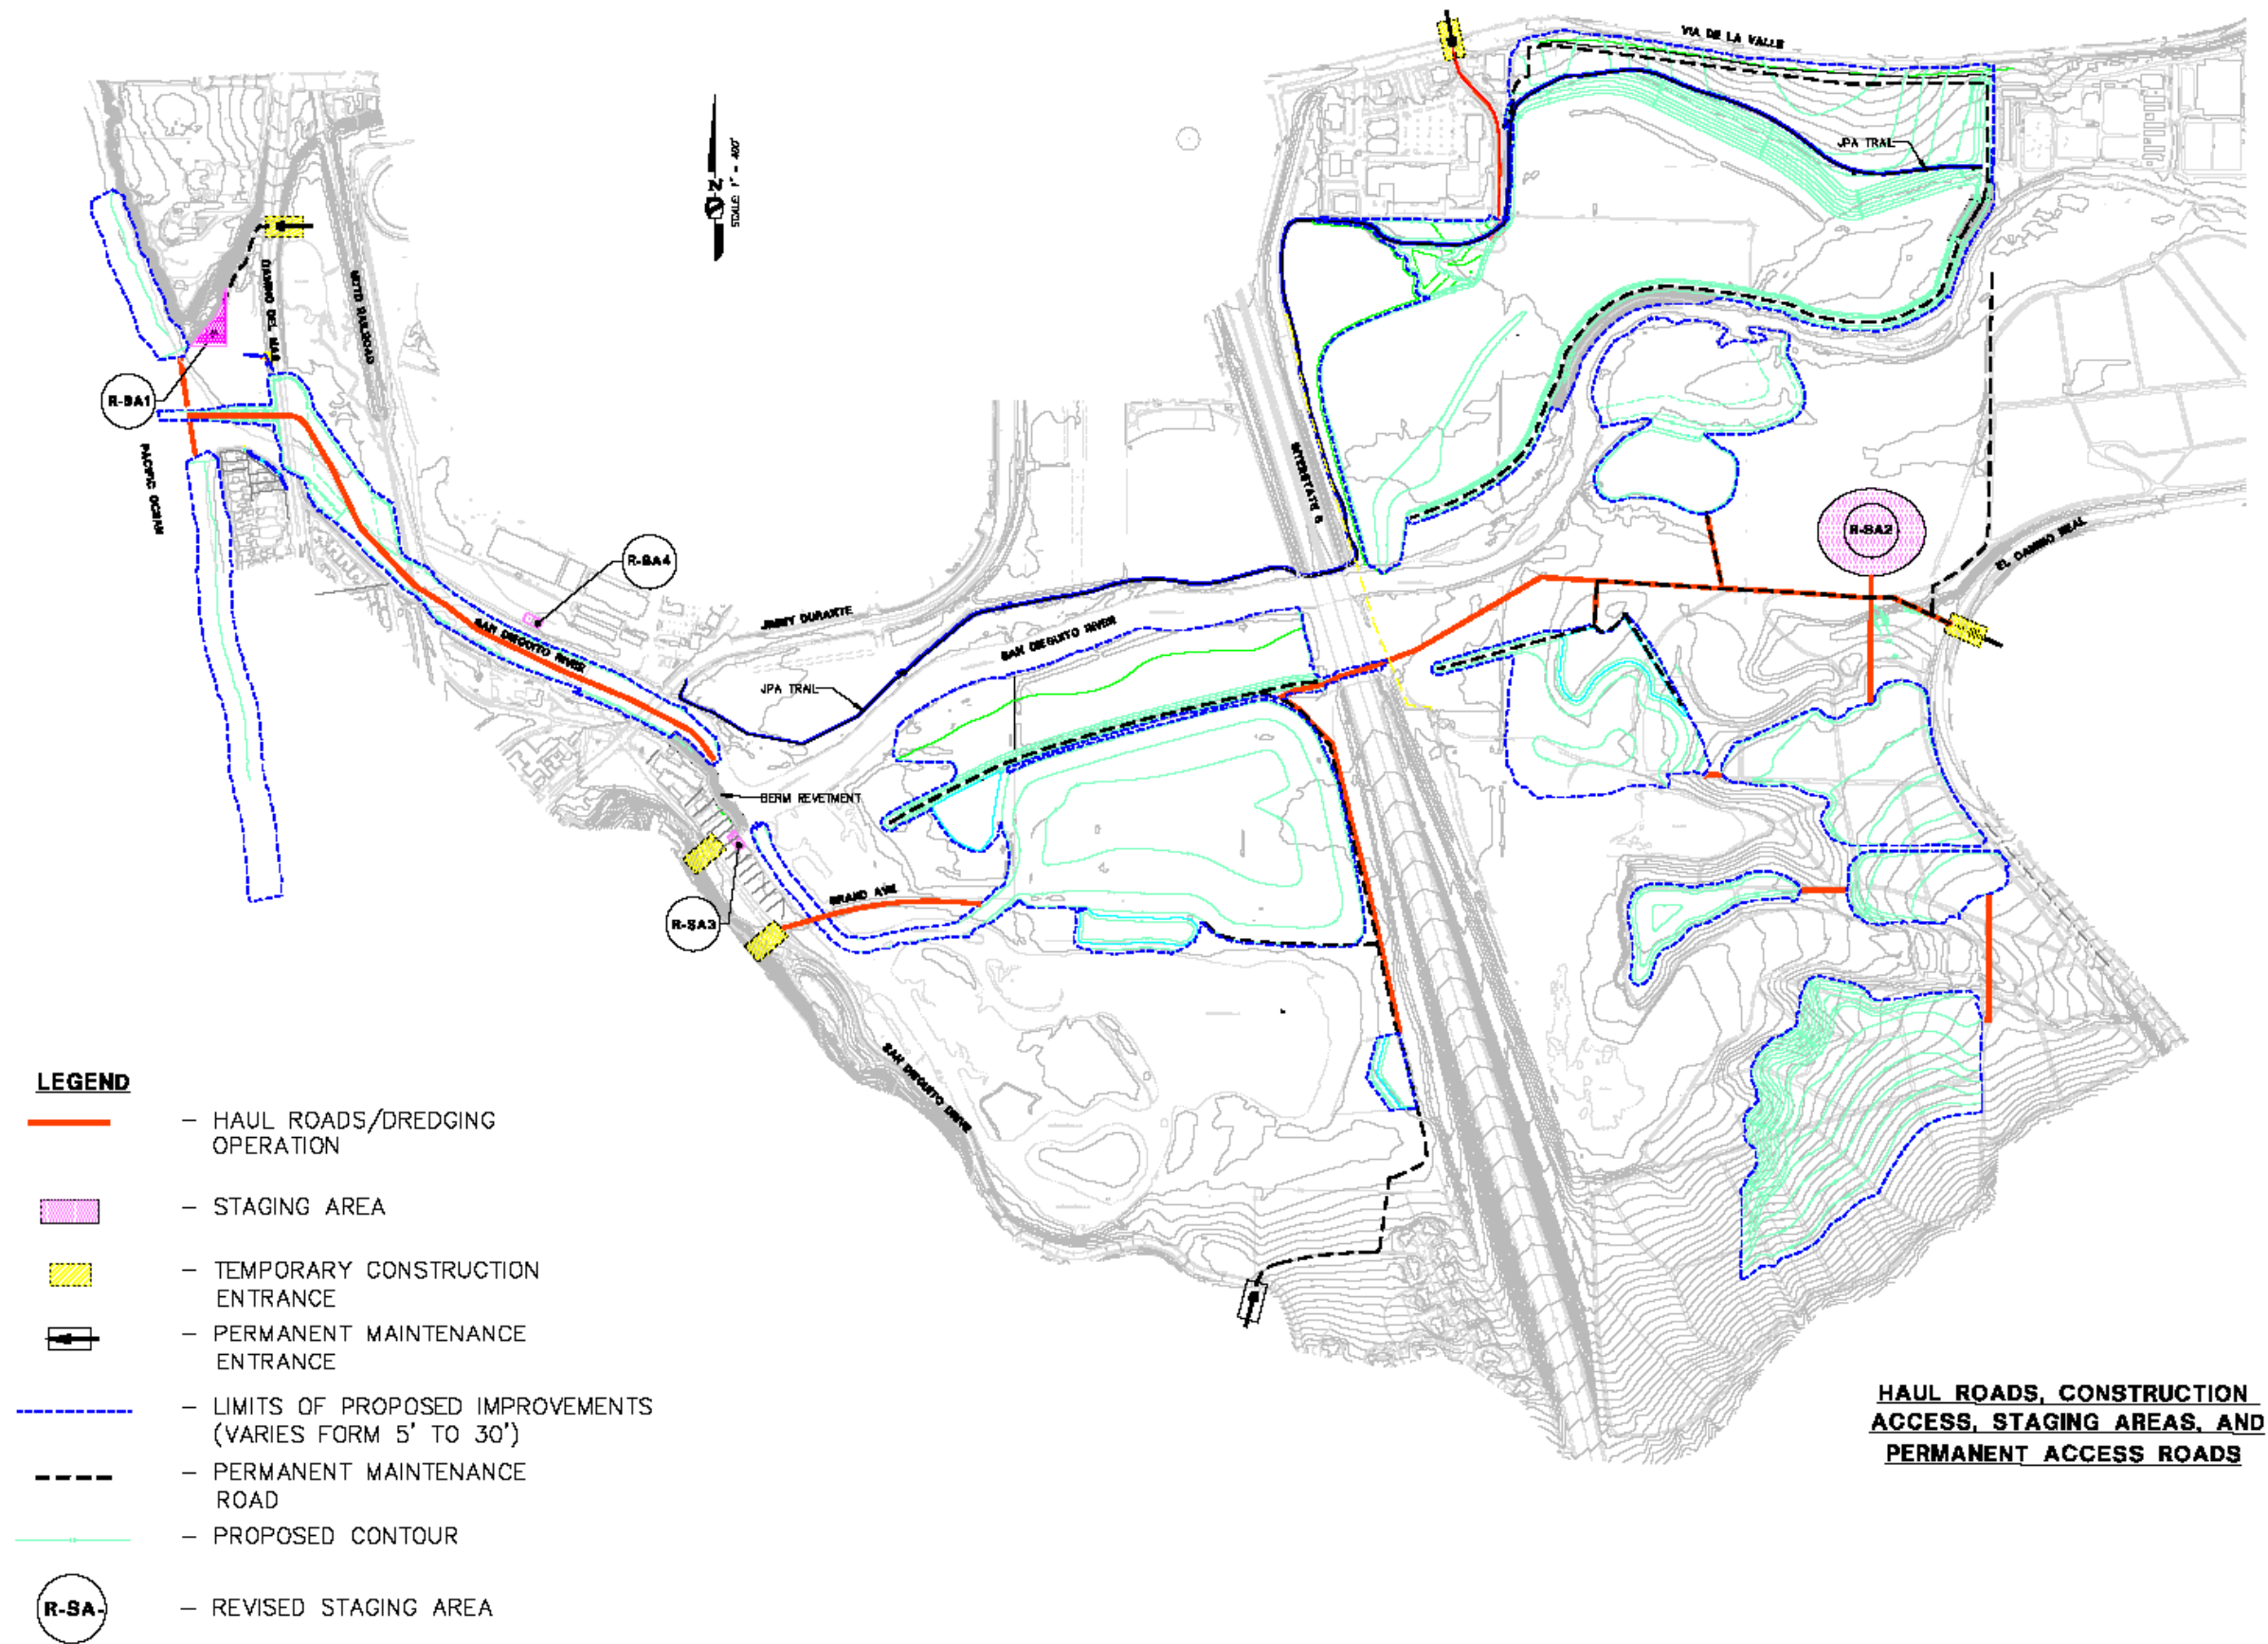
Potential Haul Roads, Construction Access, Staging Areas, and Desilting Basins
